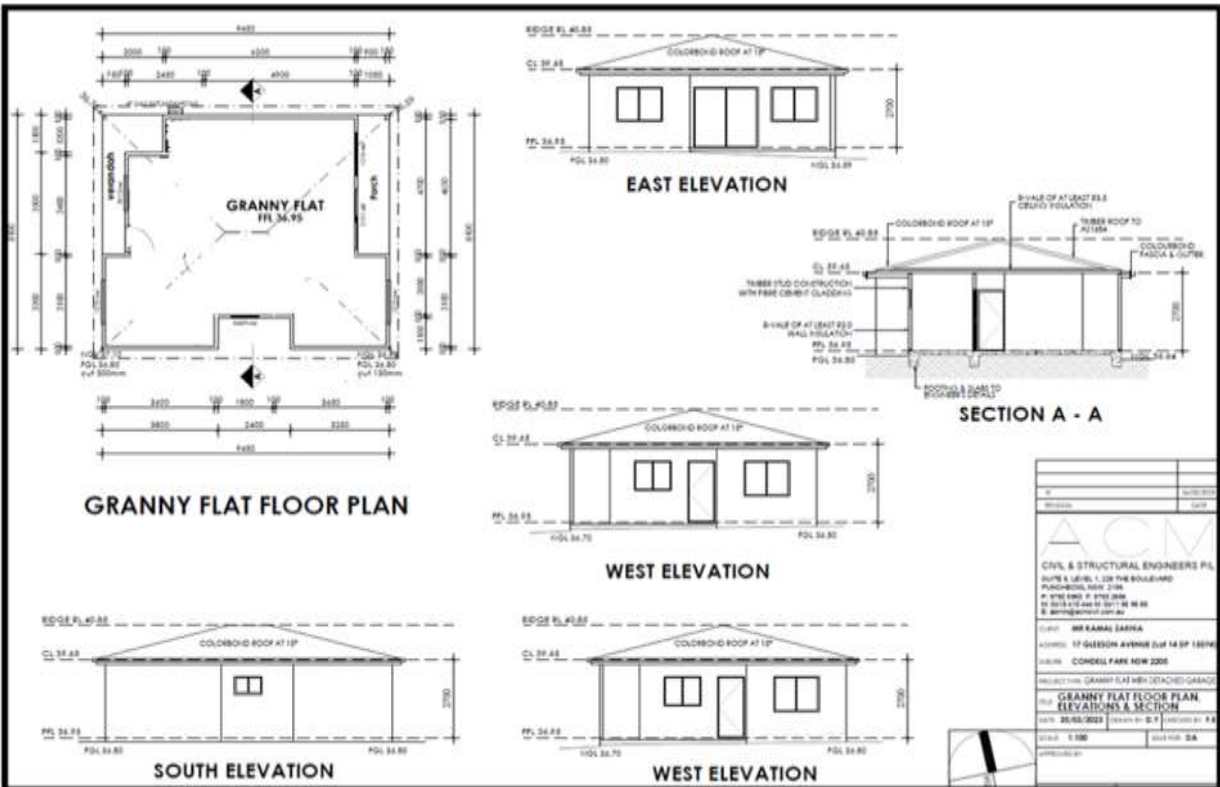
Granny Flat Floor Plan, Elevations and Sections. Source: ACM Civil & Structural Engineers
